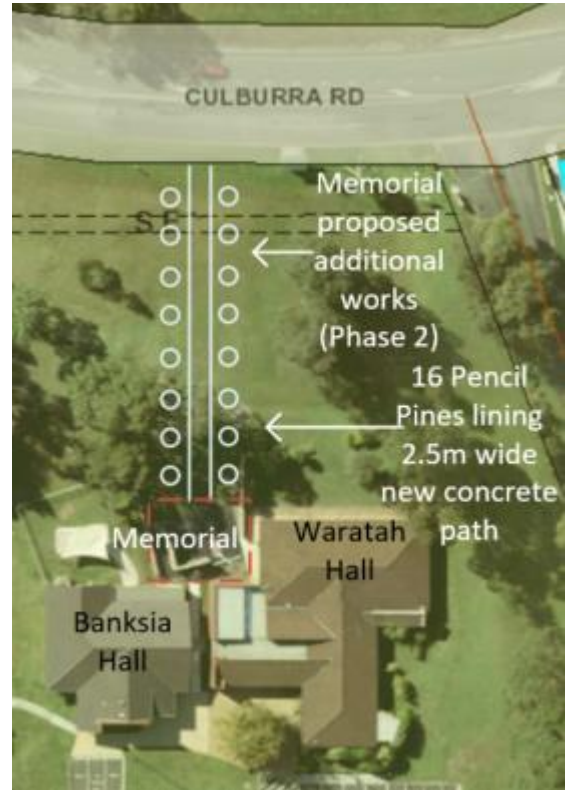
CBCC Site plan showing proposed alterations and additions to the existing memorial
